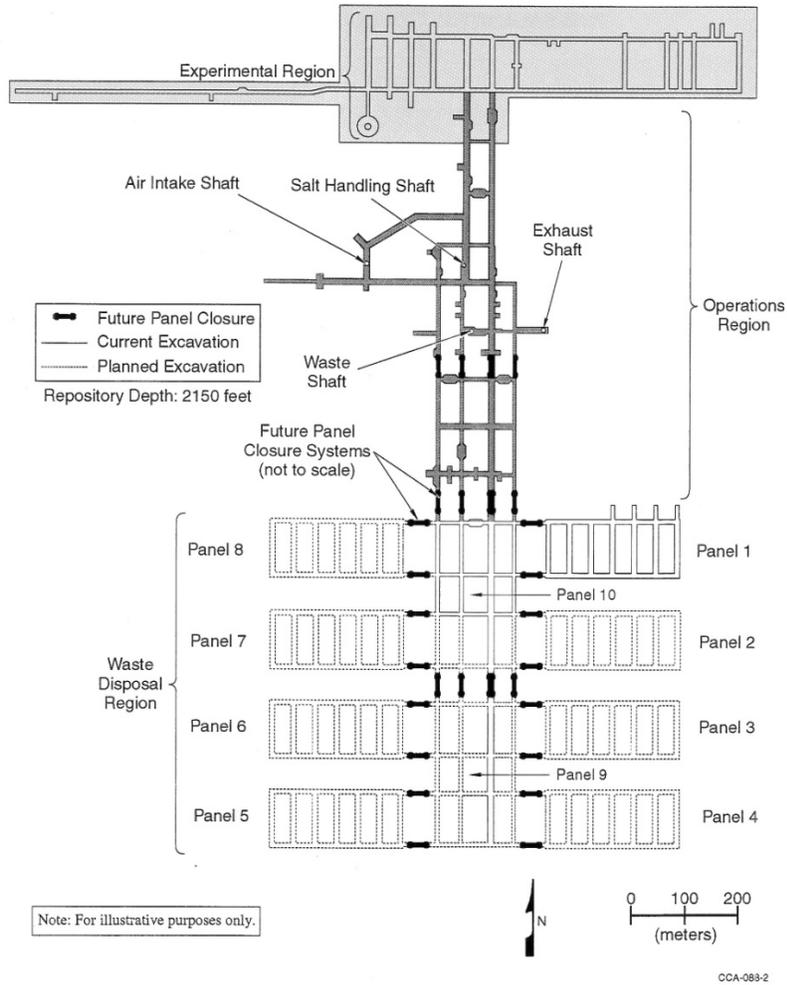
Plan View of WIPP Underground Facility and Panel Closure Systems
